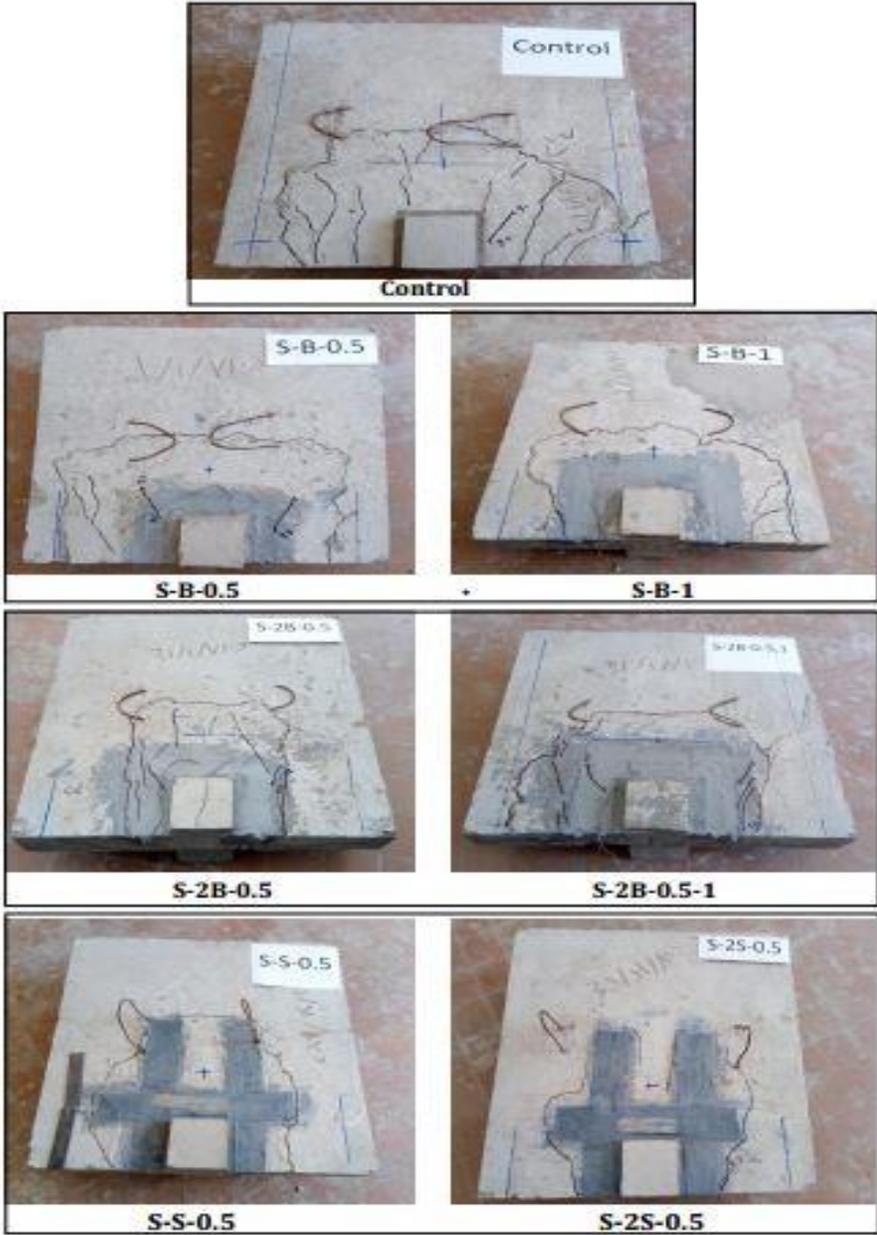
The tested specimens crack patterns at failure load (bottom faces)
